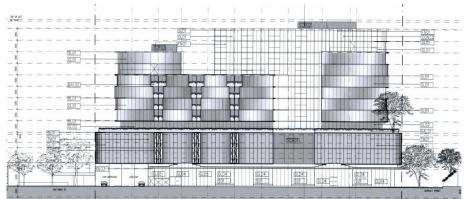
Swan Street Elevation of the 12-storey mixed use development approved at No. 462 – 482 Swan Street (Application material)
